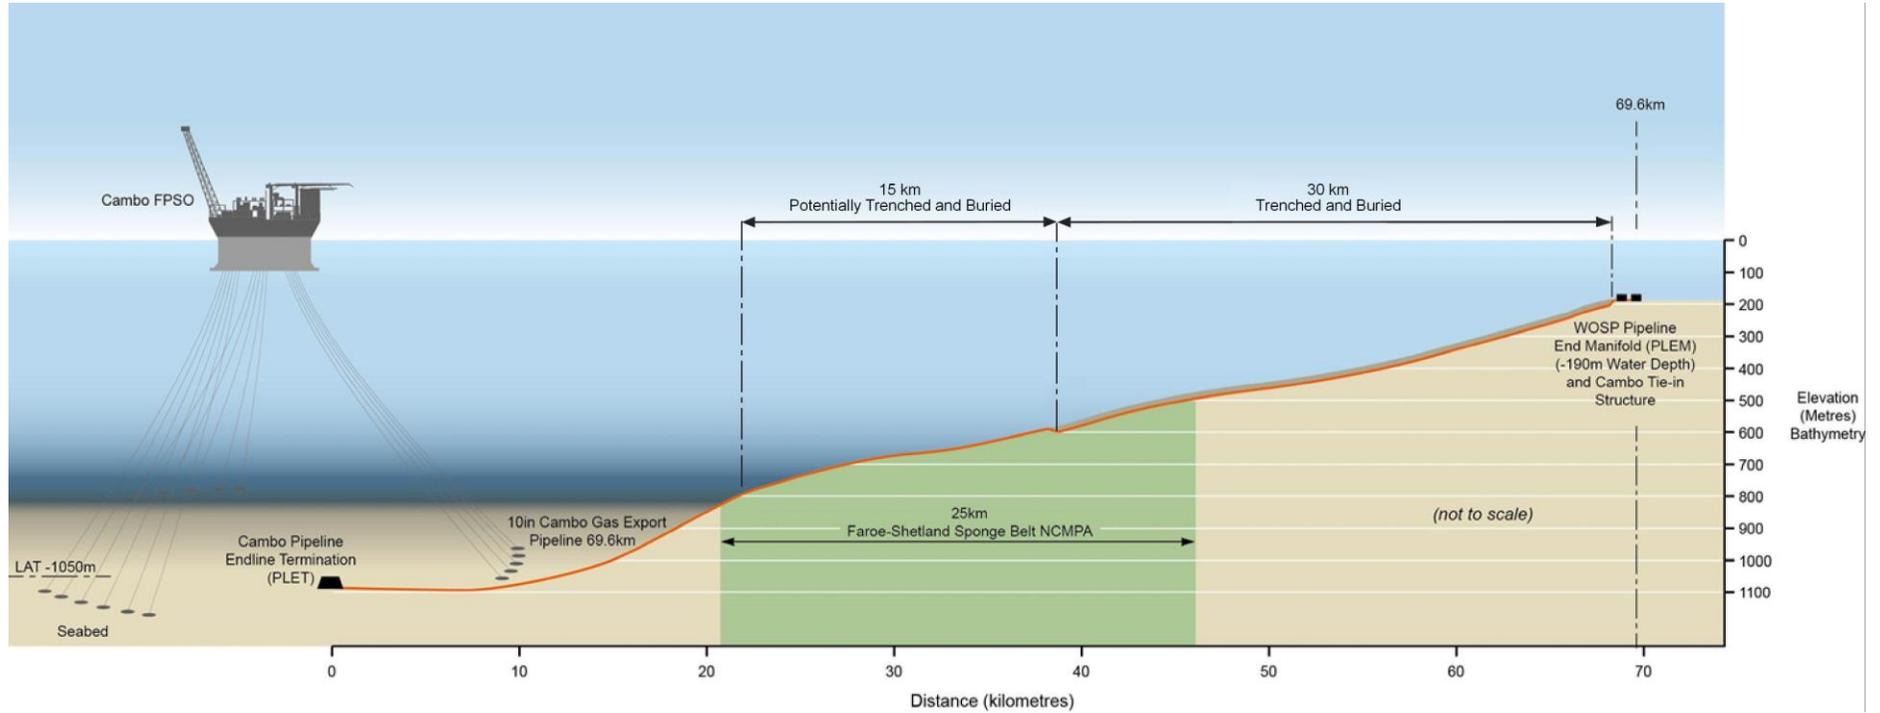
Proposed Cambo Gas Export Pipeline (GEP) Elevation
